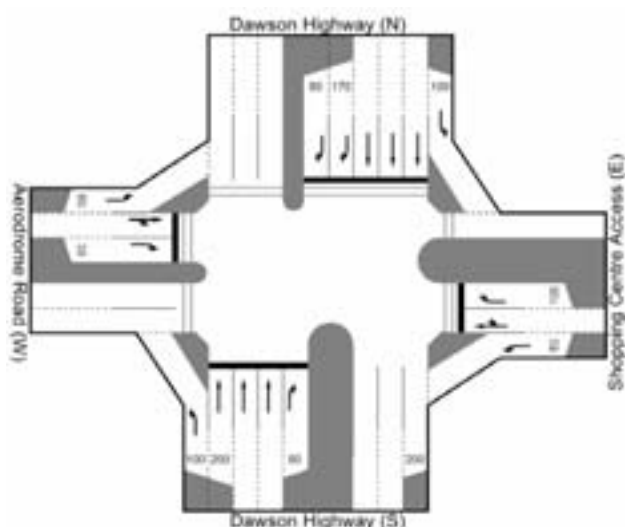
Altered Dawson Highway/Aerodrome Road/Shopping Centre intersection
